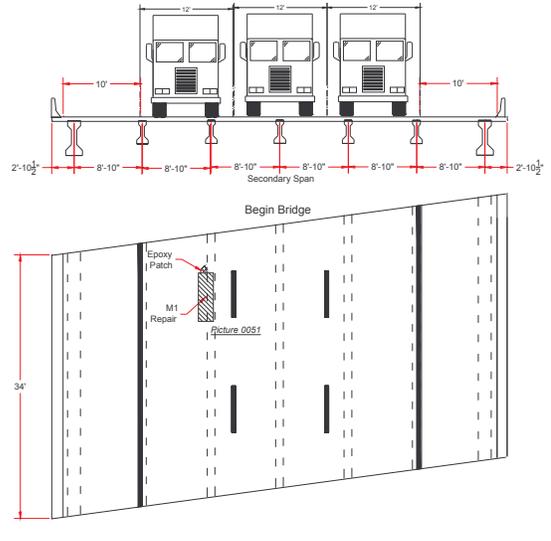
Deterioration in Bridge #100468 (March 2004)
